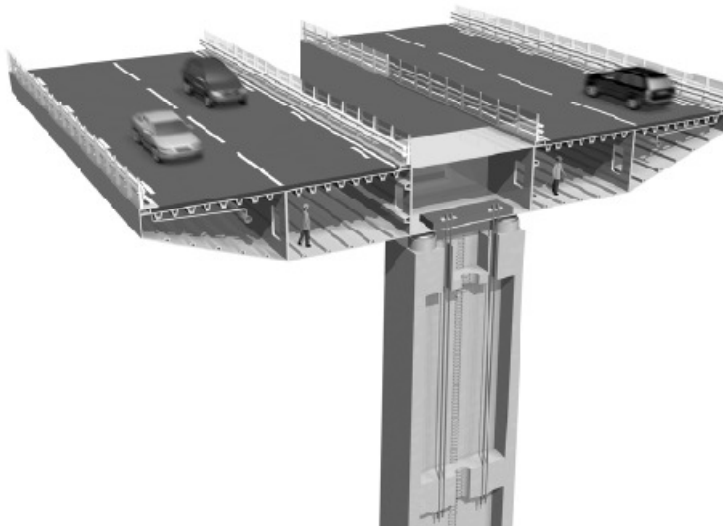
Section of the carriageways showing the cross-girders and the longitudinal stiffeners of the orthotropic plate. Vägverket (2007)
